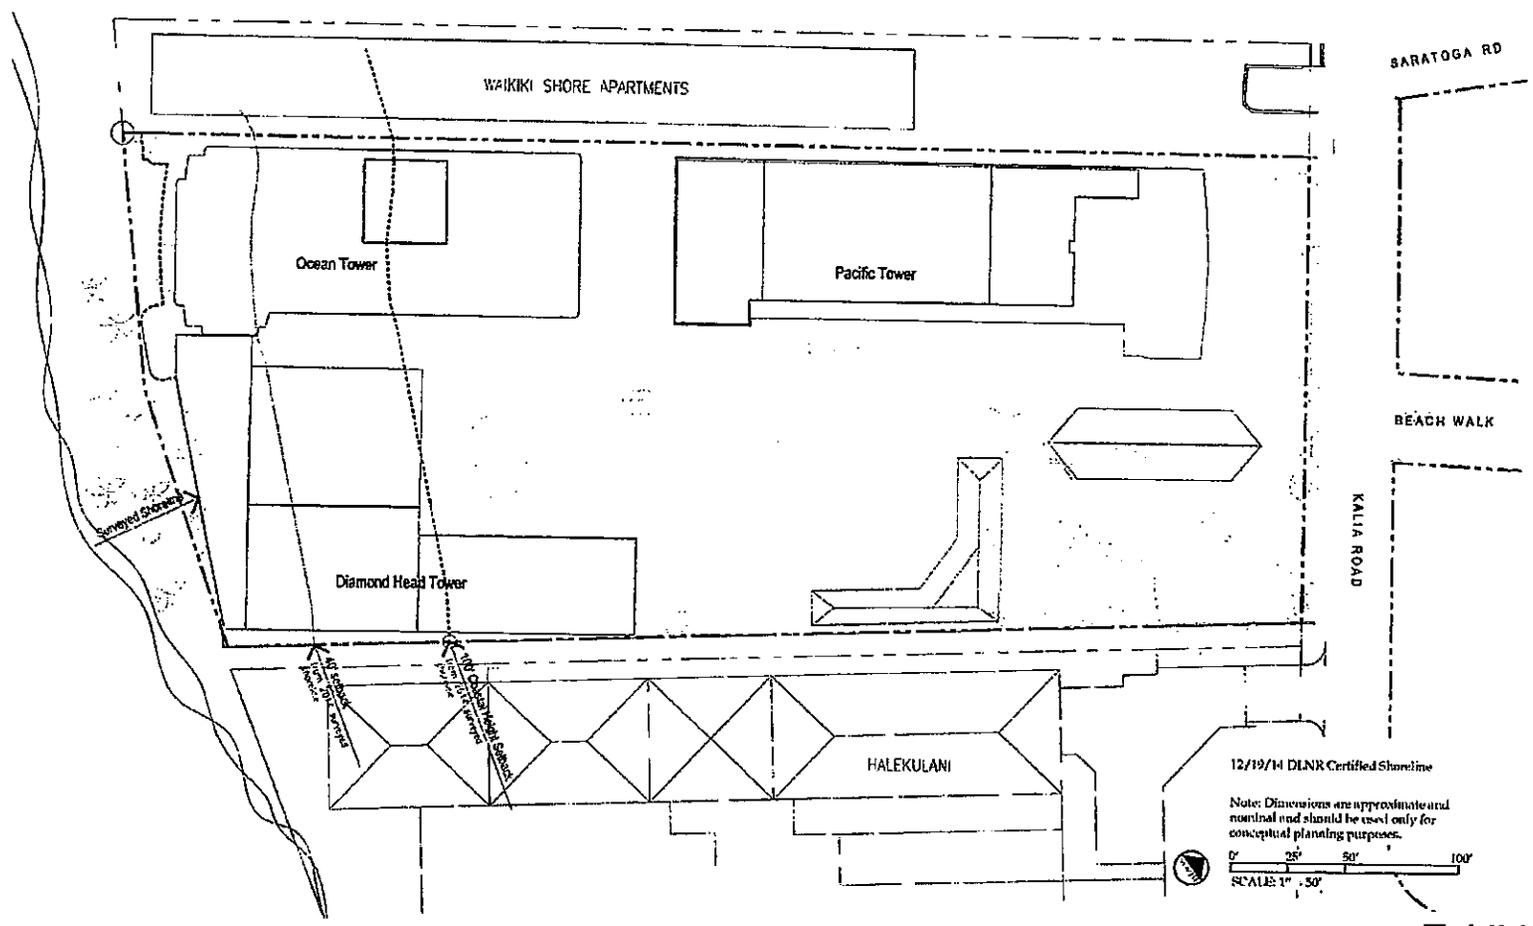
Existing Outrigger Reef Waikiki Beach Resort Plan
